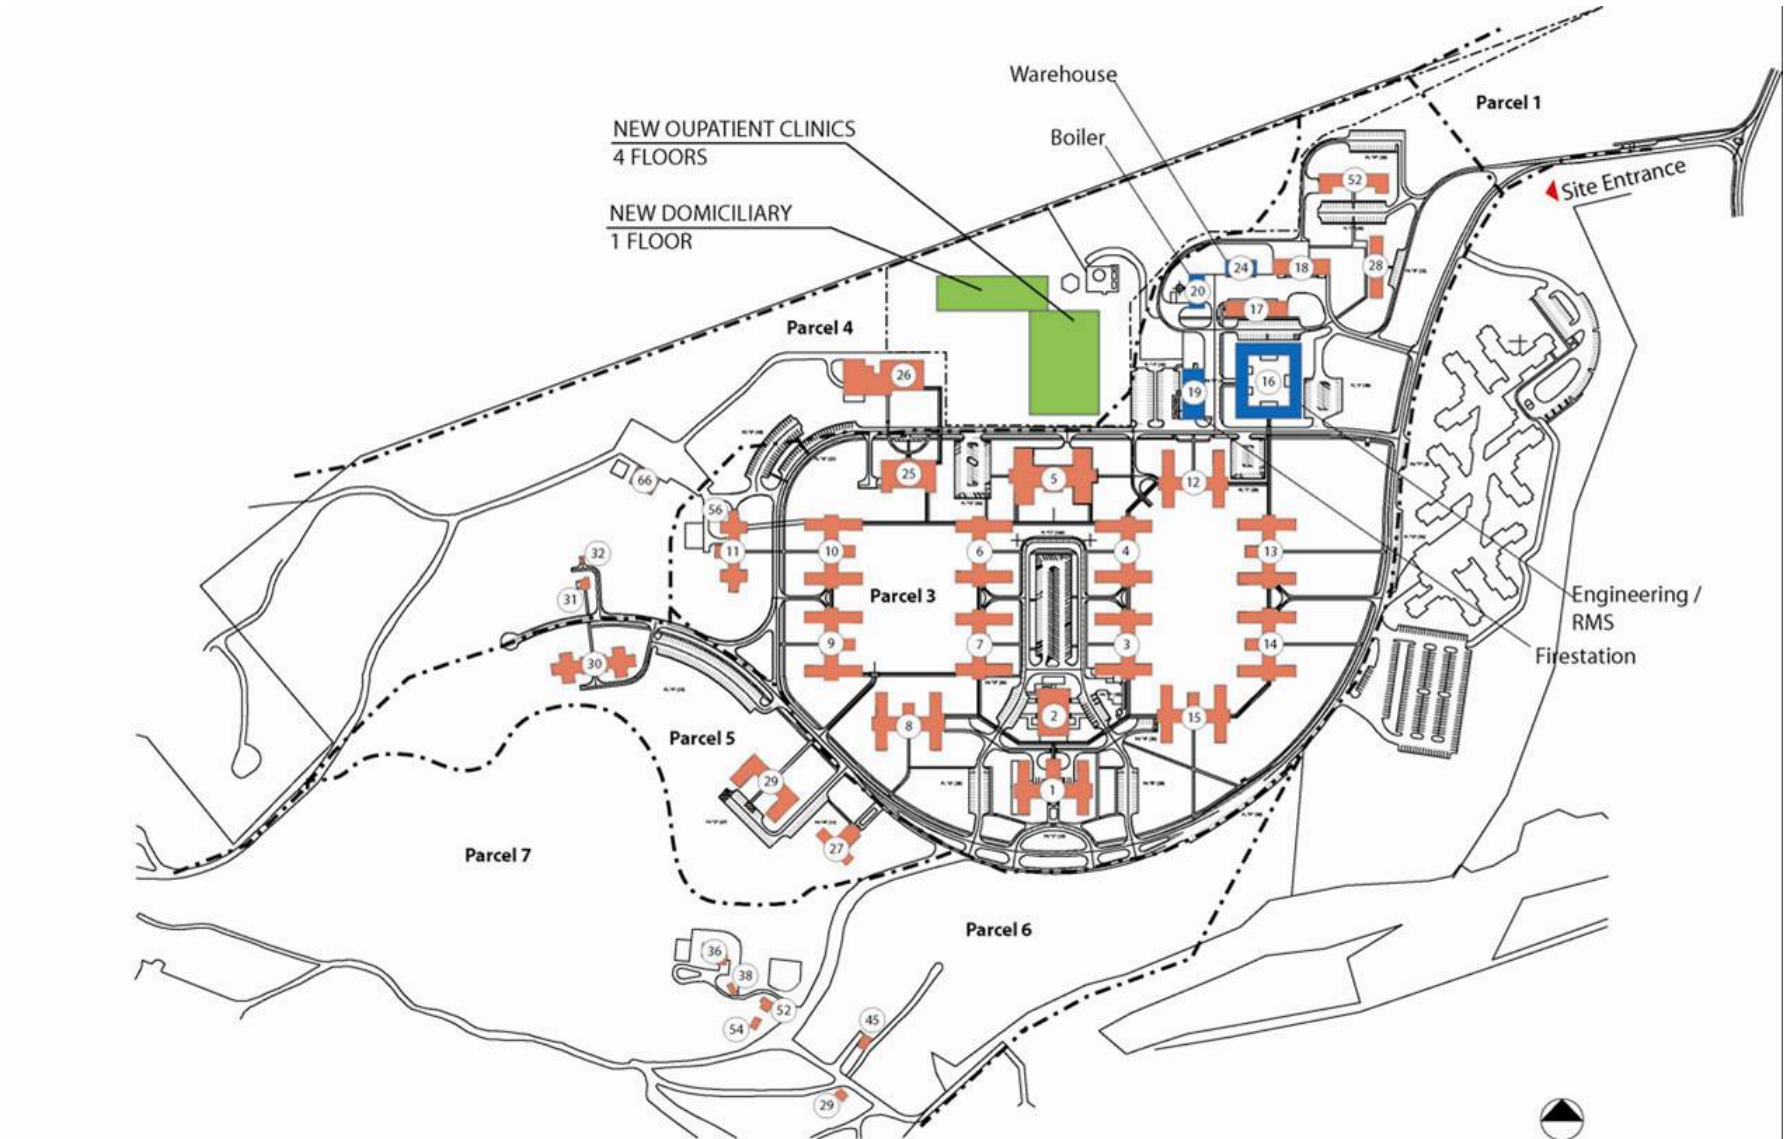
Proposed New Site Plan - BPO 3 (At Montrose, Construct New Domiciliary and Ambulatory Care Facility East of Fire Station (North Campus))
